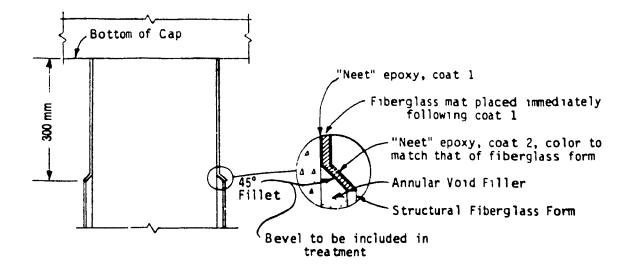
DETAIL OF STANDARD TREATMENT OF TOP 300 MM OF CONCRETE PILING (FLORIDA STATE DEPT. OF TRANSPORTATION)<sup>2</sup>
